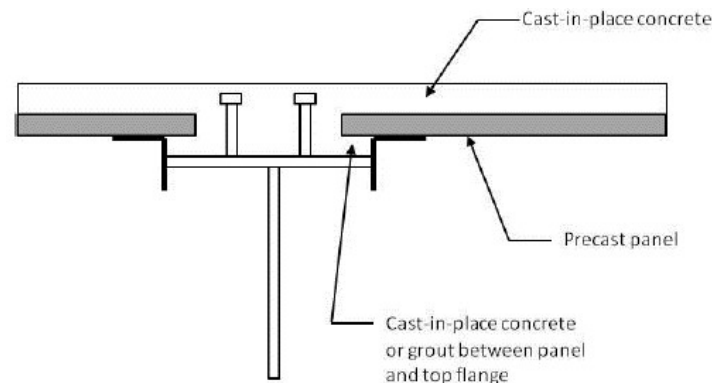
Stay-in-place formwork layout (Chavel, 2012)
